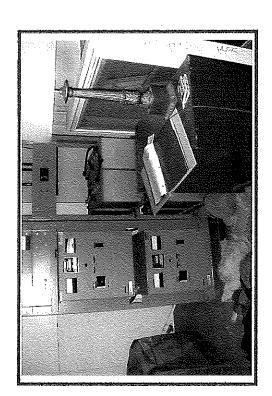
Telecommunications equipment with batteries in the Wilson Building.
